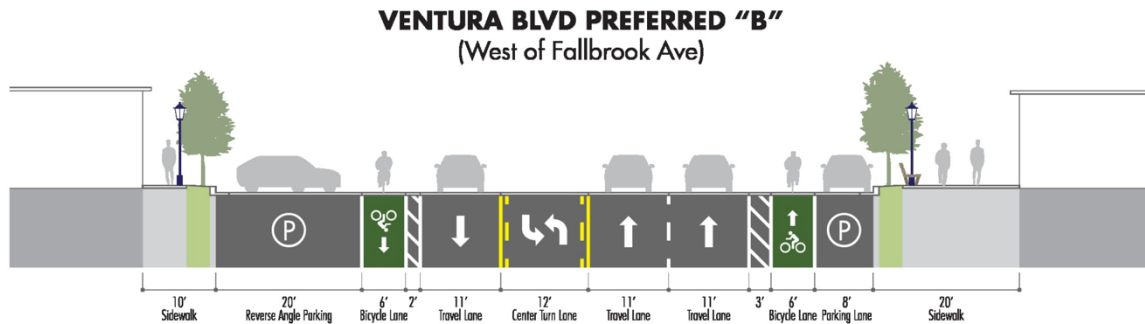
Preferred Alternative 'B' Section West (looking west)
